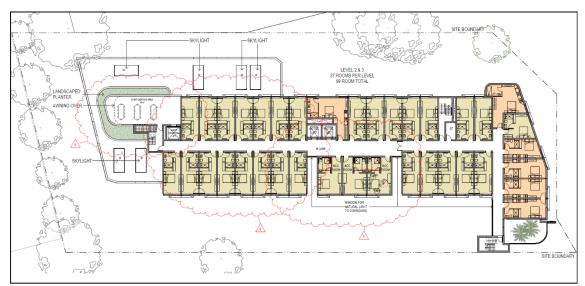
Proposed hotel level 2 plan (DA-103, Issue E)
